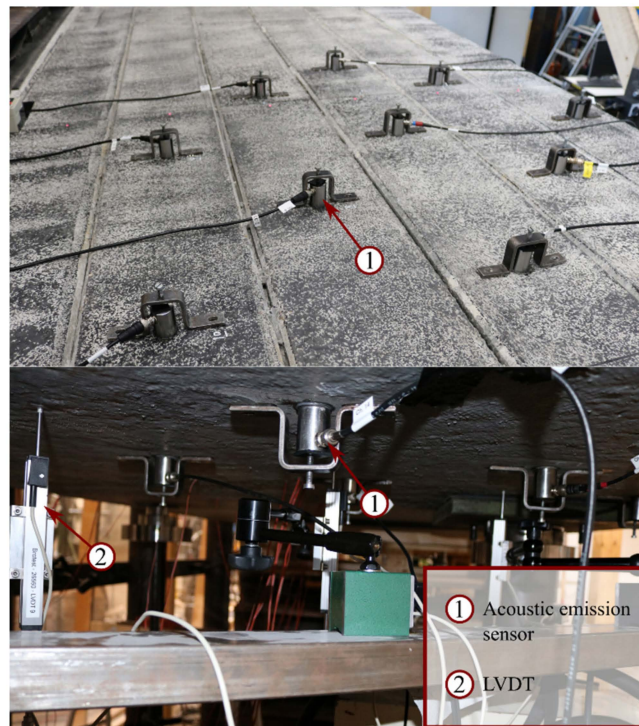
AE sensors mounted on top and bottom surfaces and LVDTs on the bottom surface.
